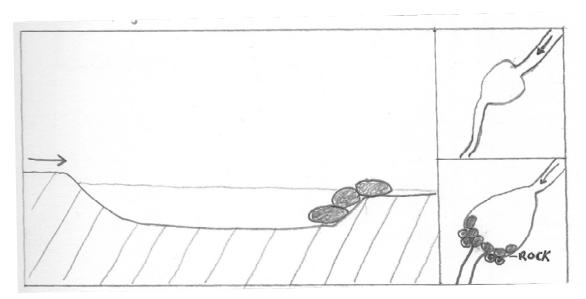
Pools in the creek. (L) longitudinal cross section showing rock revetment. (R) Plan view of pools showing before and after shape and rock placement.
